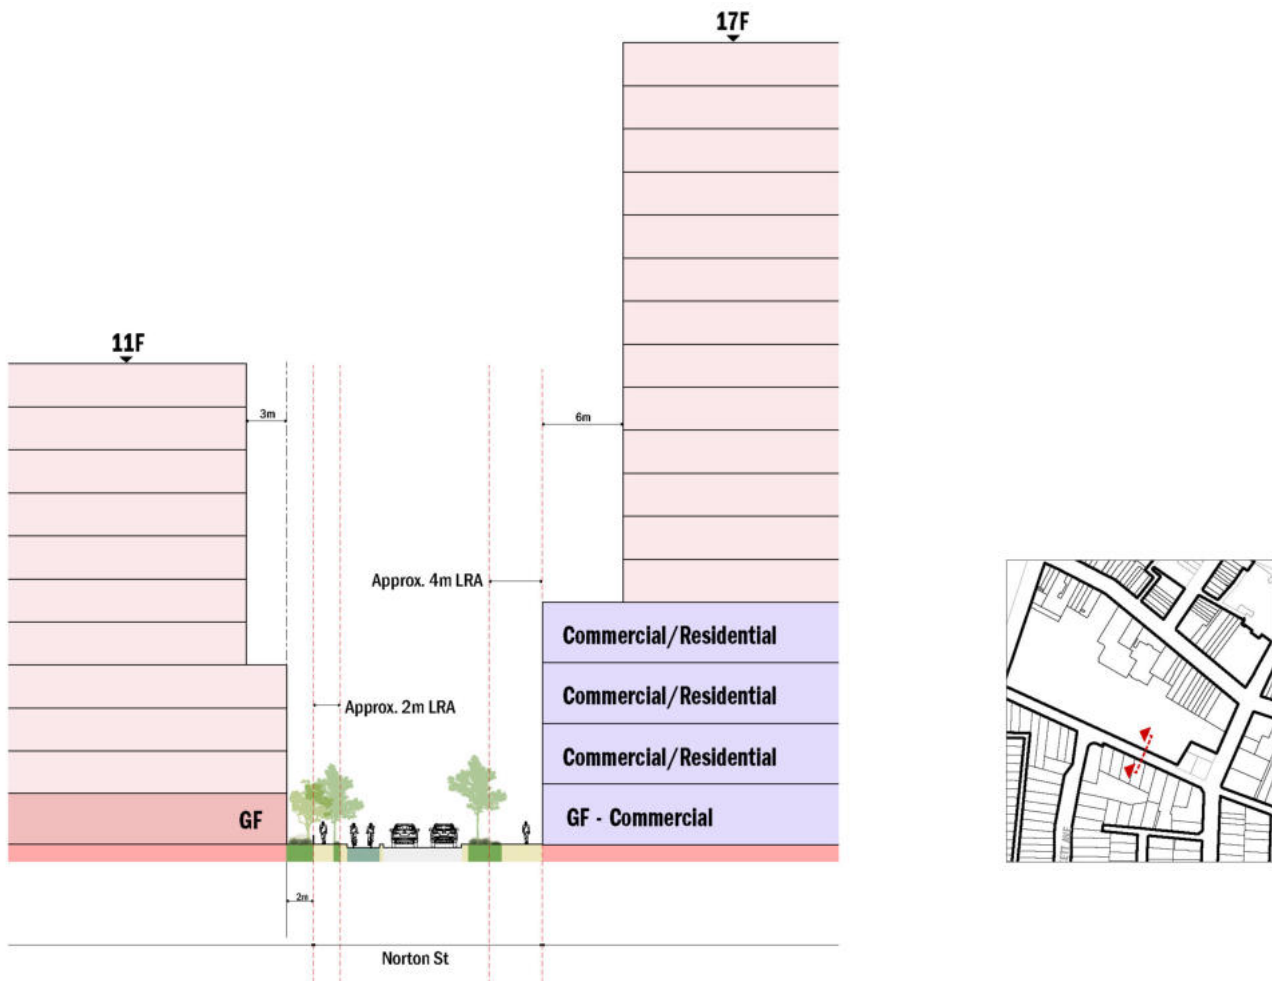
Ashfield CBD – Norton Street Section – 17 Storey (Knox to Holden Street)
